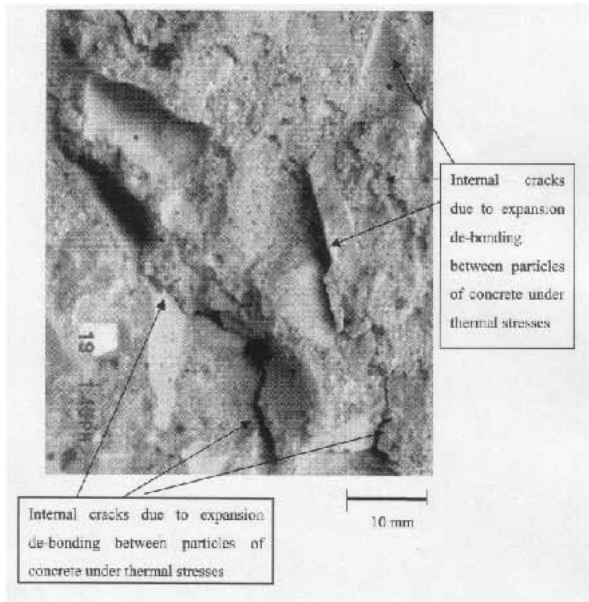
Concrete surface at failure zone indicating types of failure, fracture and de-bonding between composite components and particles.
